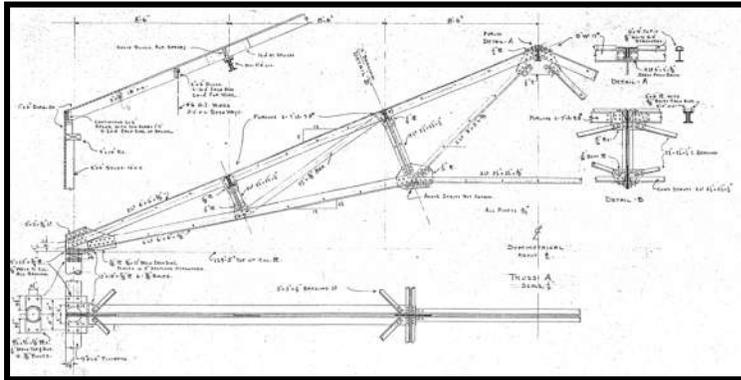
Elevation of roof trusses from the 1938 Construction Drawings.
